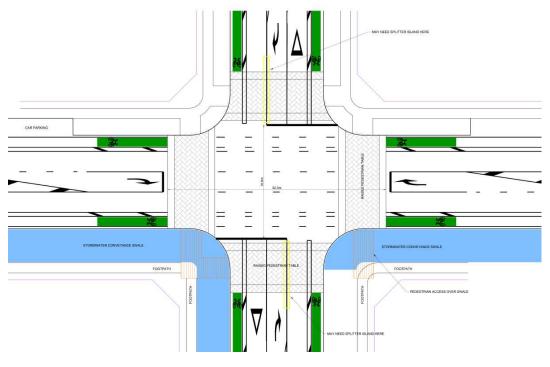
Proposed collector road/ collector road intersection layout (indicative)
